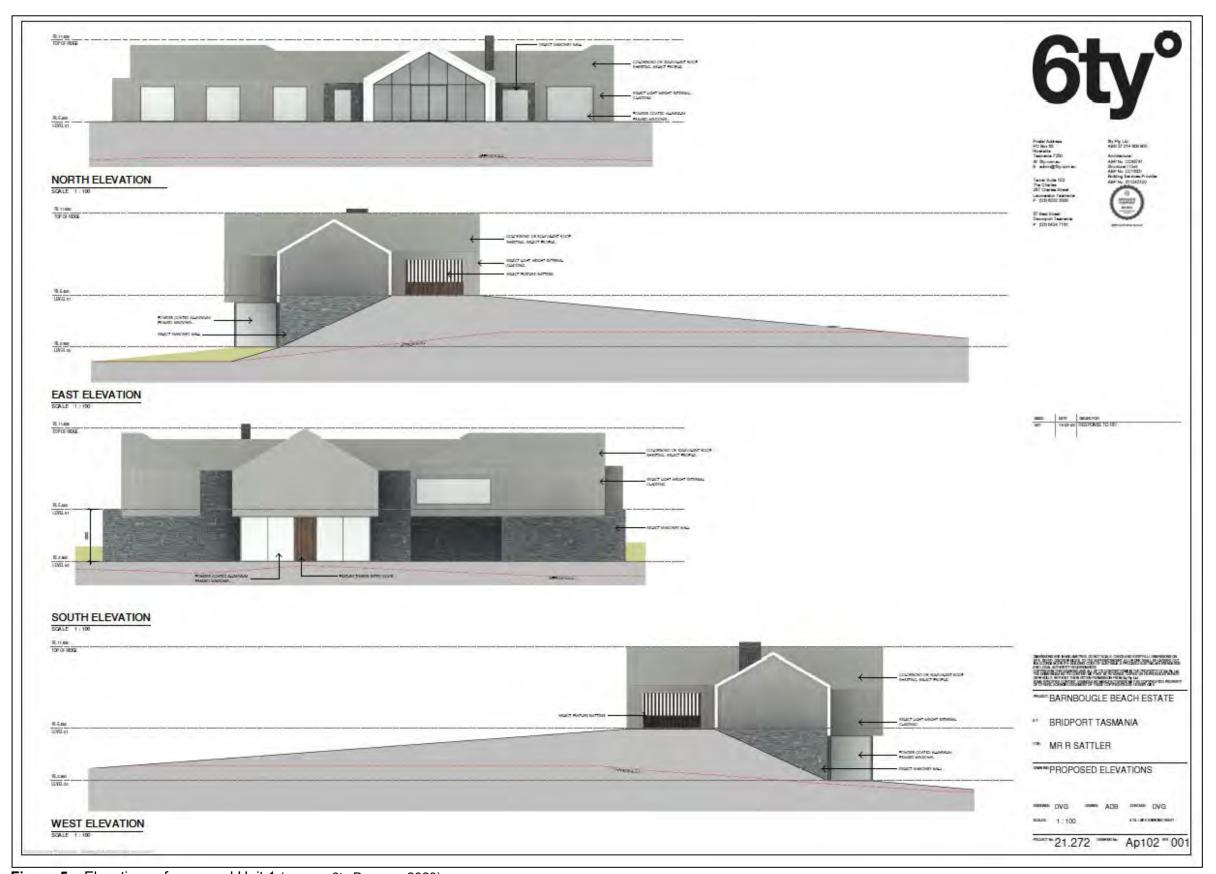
Elevations of proposed Unit 1 (source: 6ty Degrees 2023)
